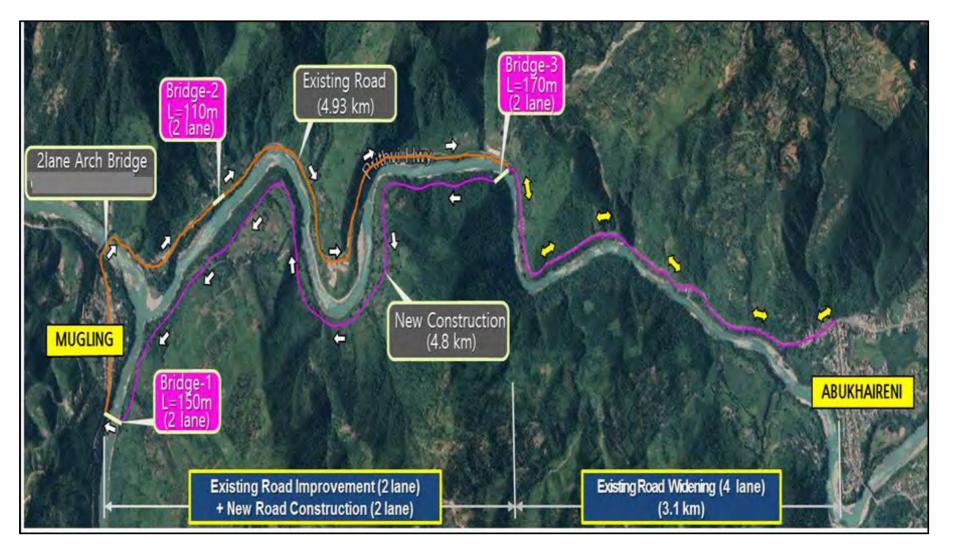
Alignment of Route Alternative 1 of Mugling – Abukhaireni Section
